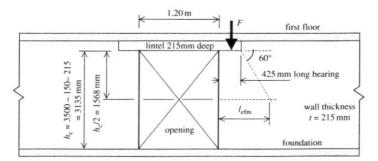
Arrangement of opening, lintel and bearings for Example 4.5
